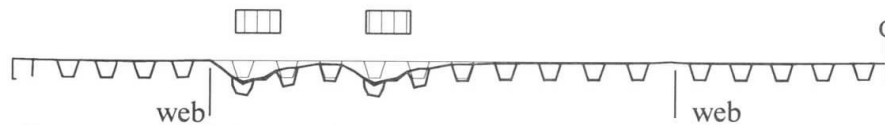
Cross section of deformed deck under wheels loading (3D FEM model).
